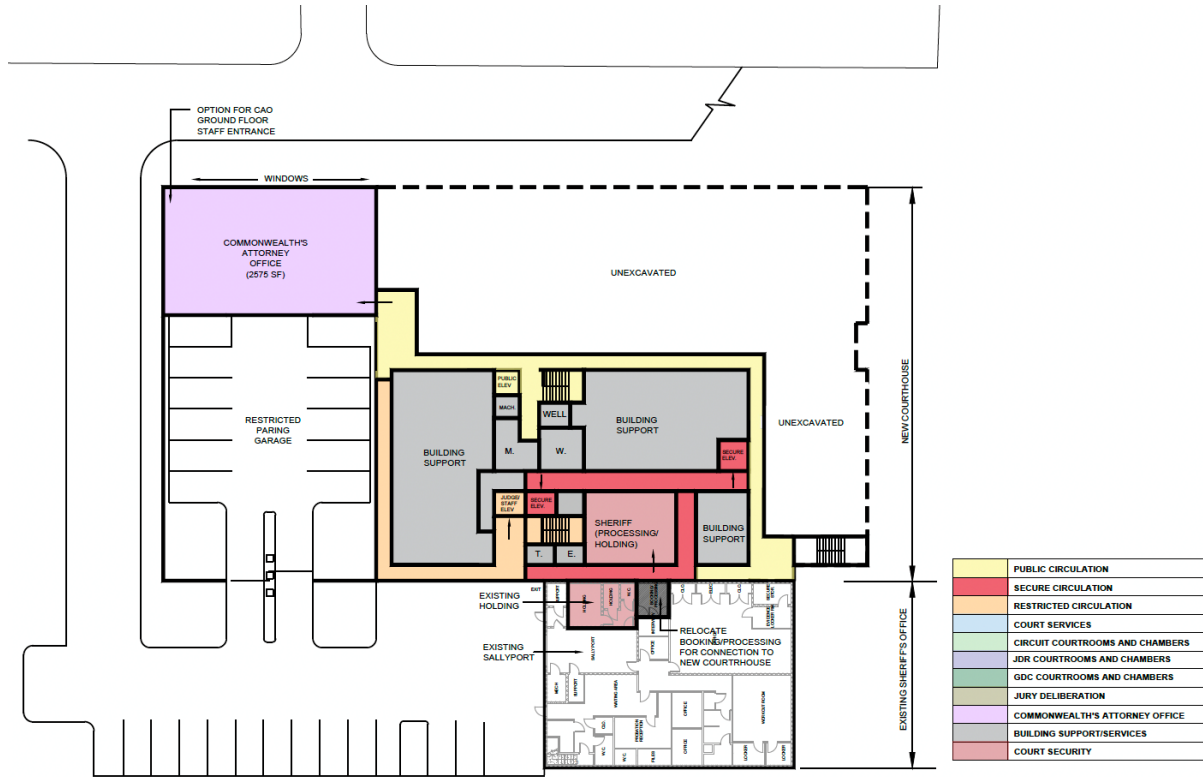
Option 3 - New Courthouse (Connected to Sheriff’s Office) First Floor
